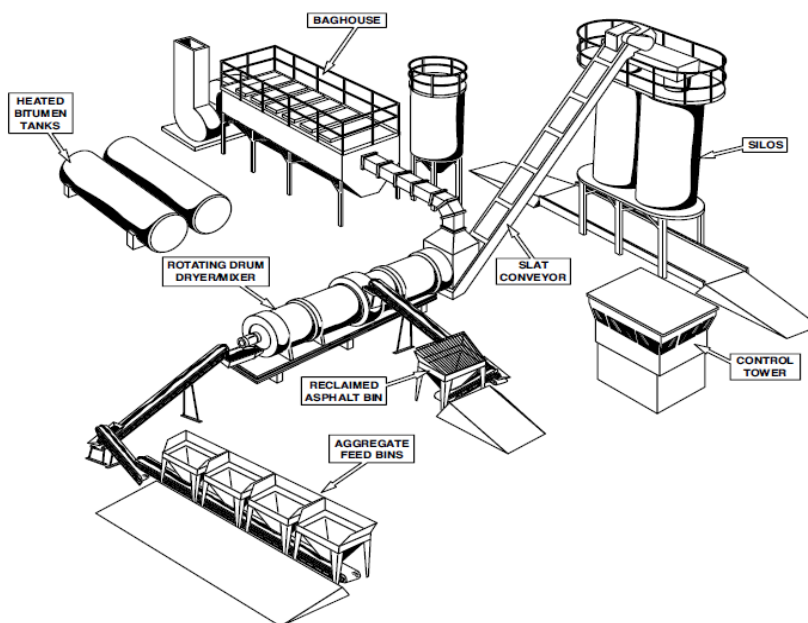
Drum-mix plant layout (European Asphalt Pavement Association, 2011)
